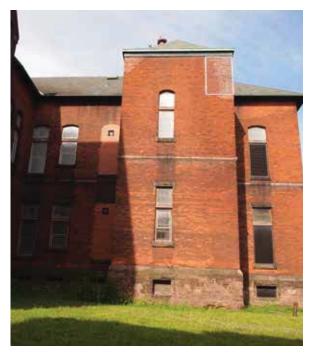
East Elevation of Central Bay on North Elevation (CJSA 2019)
